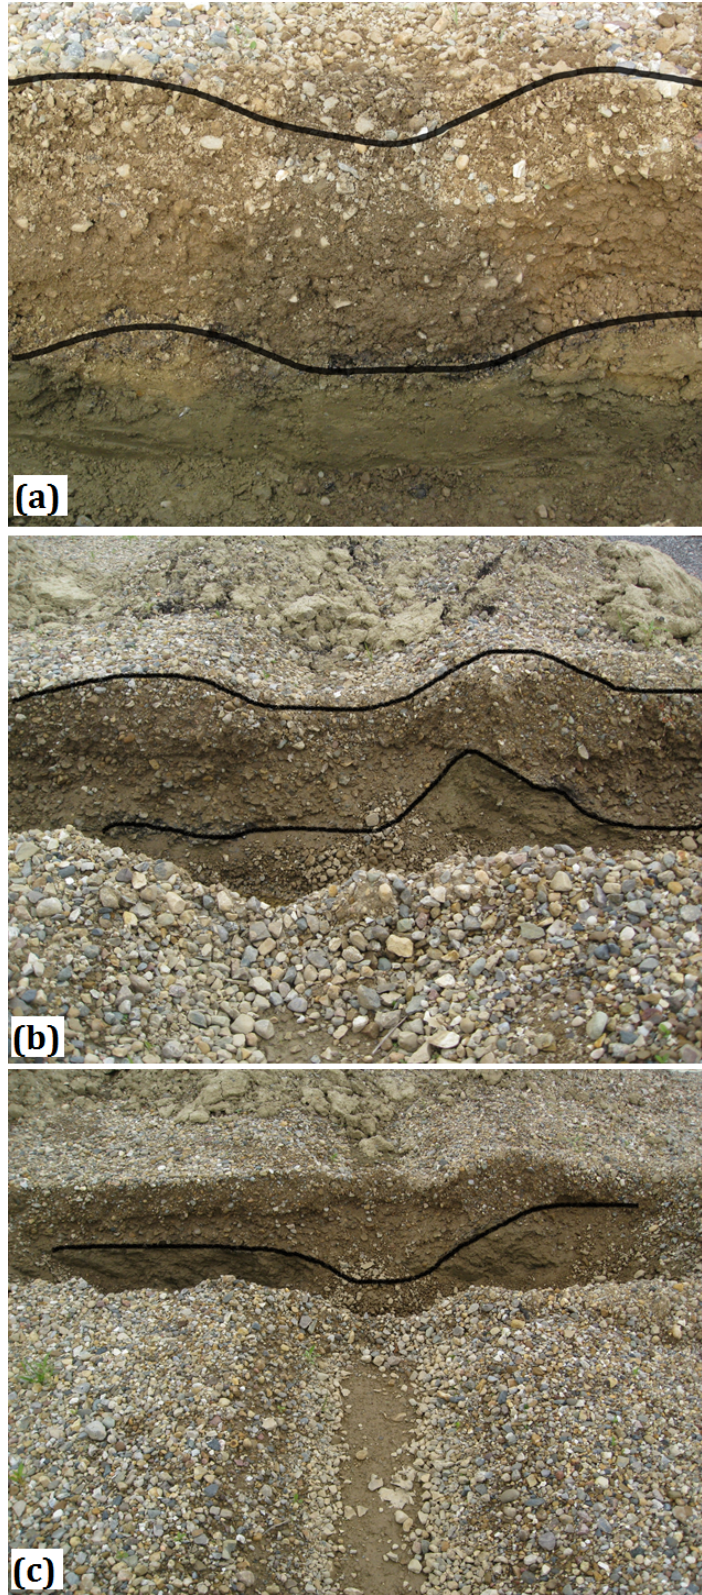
Excavated Trench Photos Showing Surface and Base-Subgrade Interface Deformations in Test Sections (a) 1, (b) 2, and (c) 3 for Cell 1 due to Loading under Flooded Conditions
